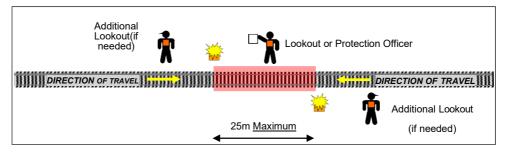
Example of general arrangement of a work location using yellow high visibility flashing light to warn Tram Traffic crews and Lookouts to warn workers
